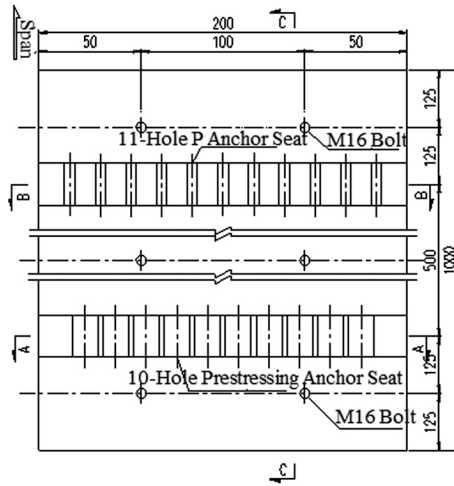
Plan view of anchor 1 on the bottom of the beam (unite: cm)
